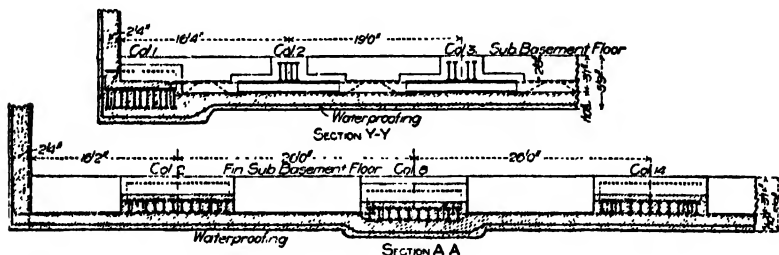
h*.—Cellar-Floor Sections Showing Grillage Beams and Reinforced-Concrete Girders, Pope Building, Cleveland, Ohio.
